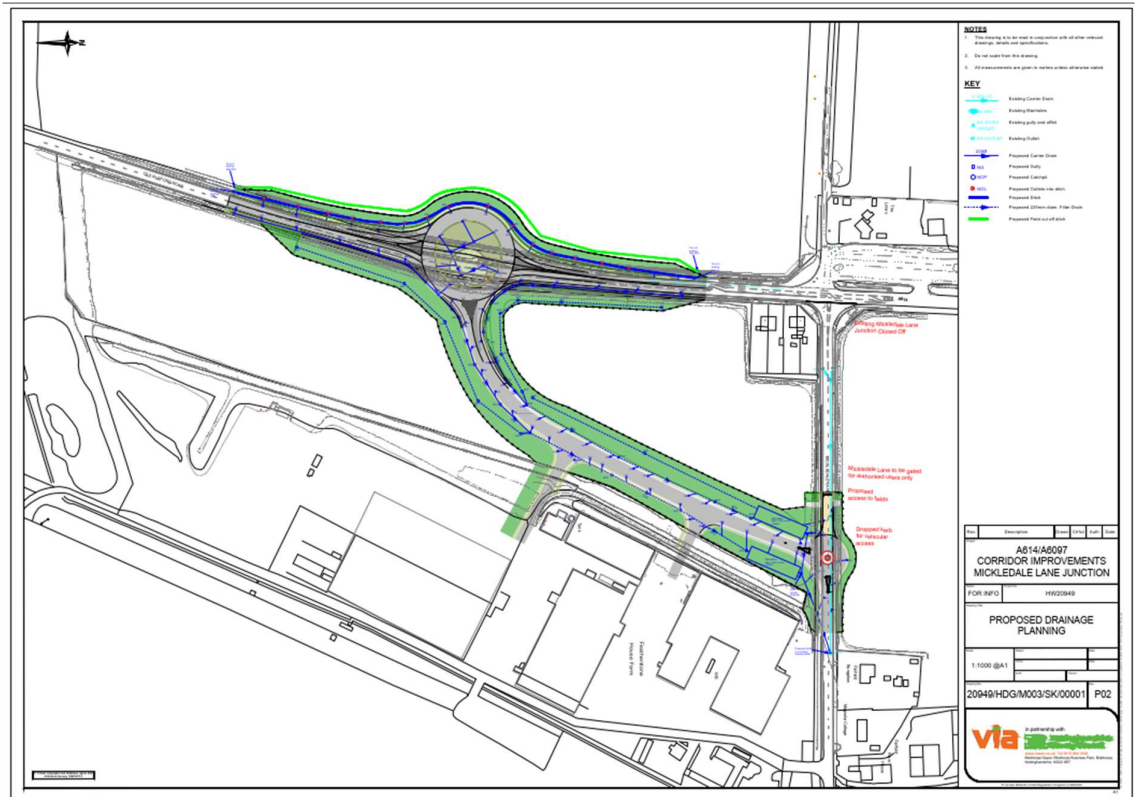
Mickledale Lane Roundabout Proposed Drainage
